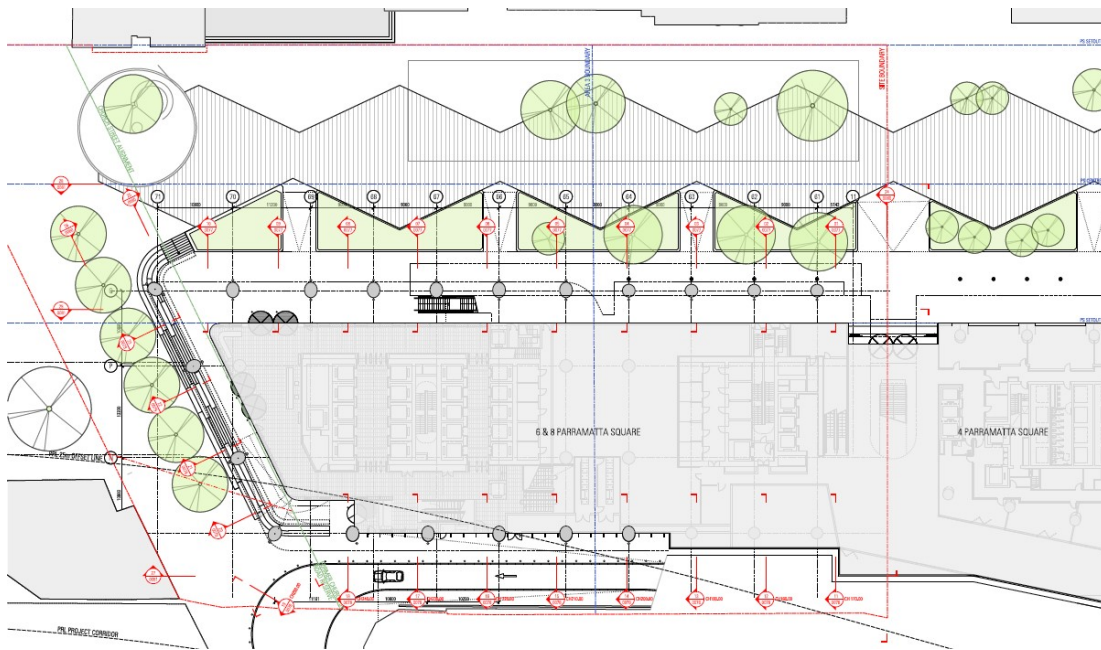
Lower Ground Floor Public Domain Alignment Plan
